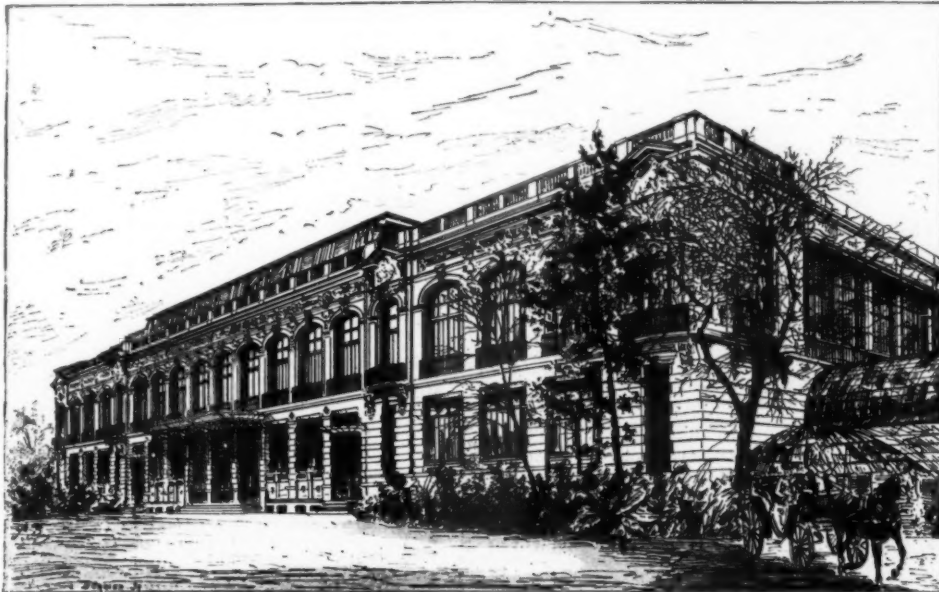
PERSPECTIVE VIEW OF THE NEW BUILDING.
